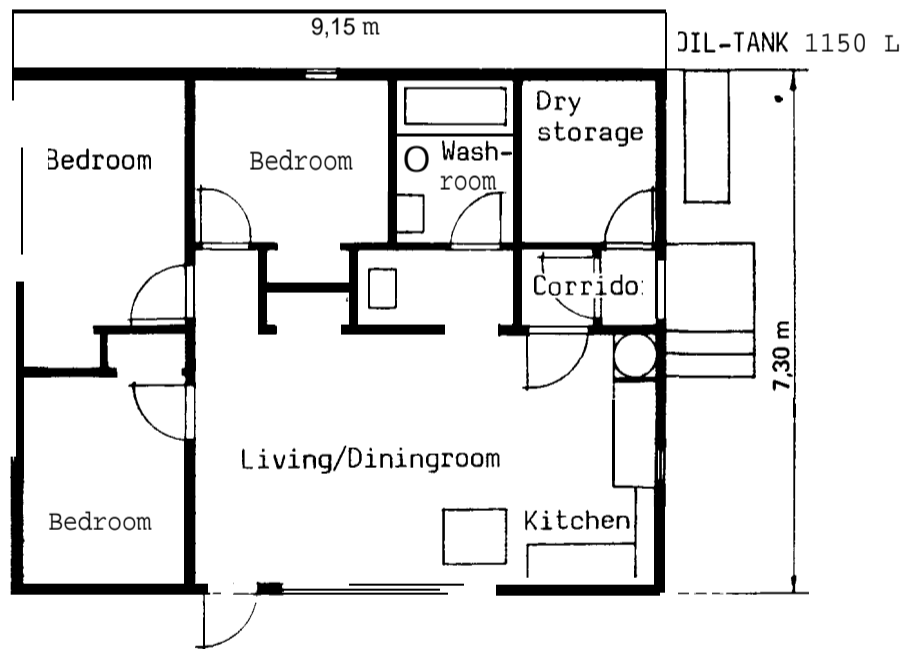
SINGLE FAMILYHOUSE 1968 - 1:100
